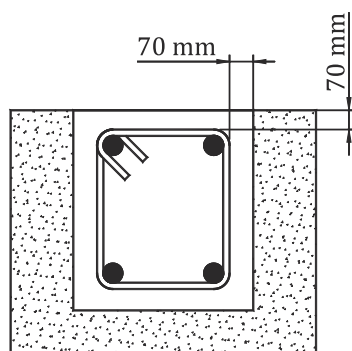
All types of reinforcement of elements cast and permanently exposed to earth or water (Minimum concrete cover: 70 mm)
